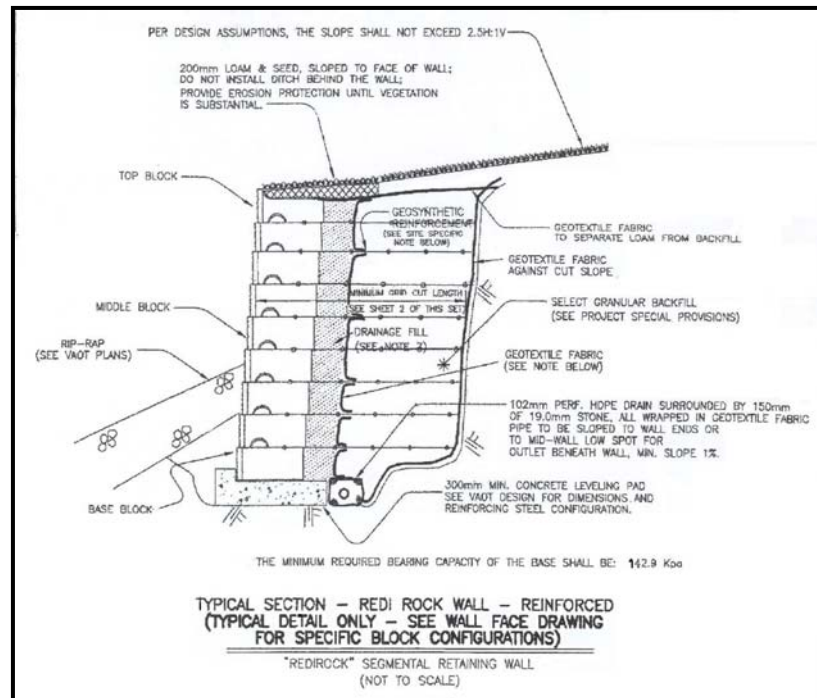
Typical cross section of Redi-Rock™ retaining wall.
